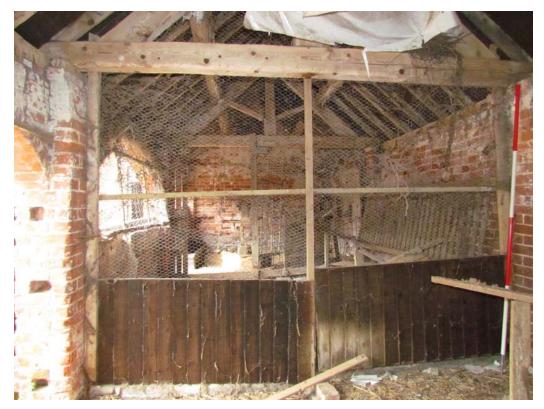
View Across Bay 1, Looking North-west (Scale = 2m).
